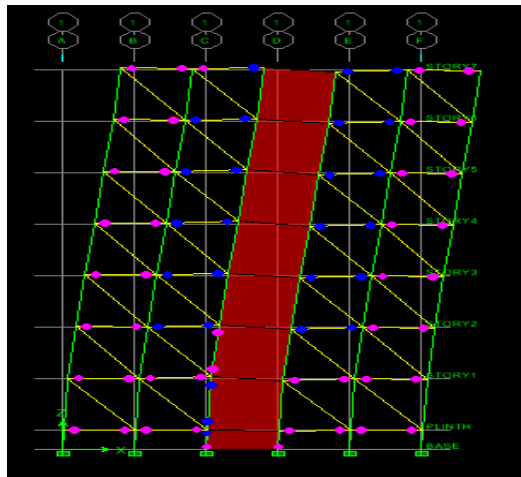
Plastic Hinges Formed in Frame with Brick Masonry Infill and Shear wall in X And Direction.
